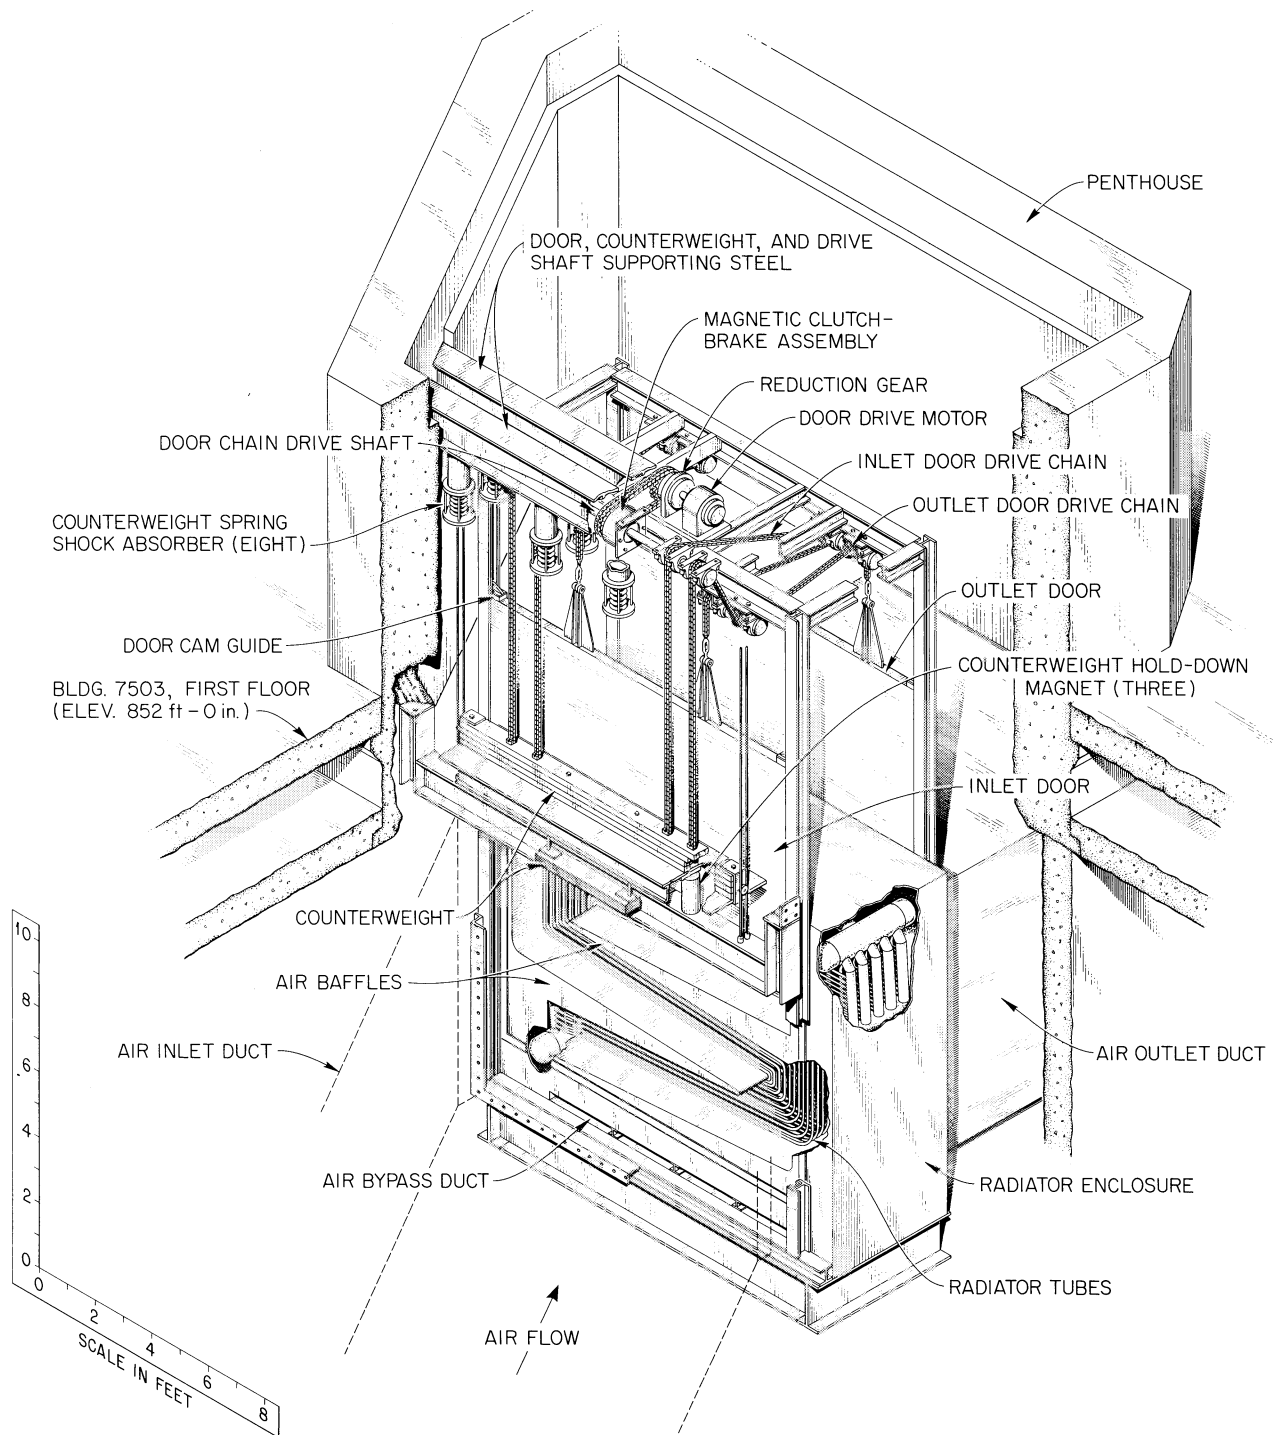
MSRE Radiator Coil and Enclosure.
